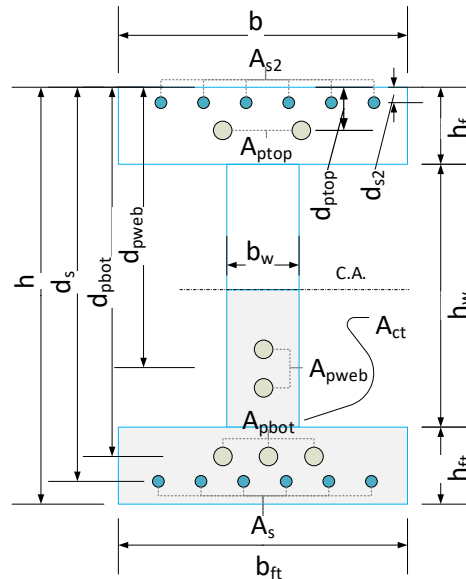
Notations used for cross-section dimensions and longitudinal reinforcement parameters
